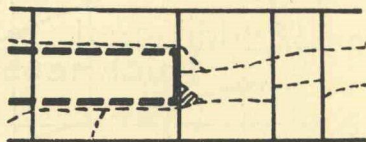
Plain and reinforced sections, Road No. 120, Forest Park, Maryland, showing reinforcement in part width of road only
